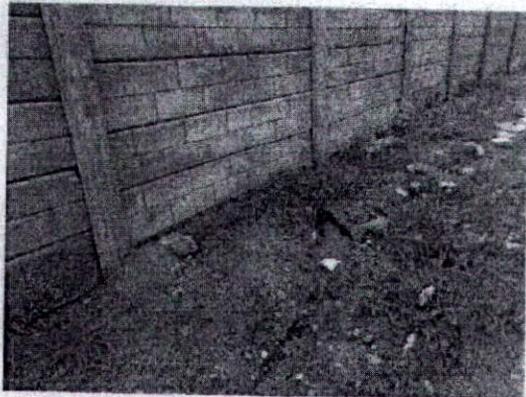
Photo of gaps below the boundary wall around the dump site through which fluids can leak
